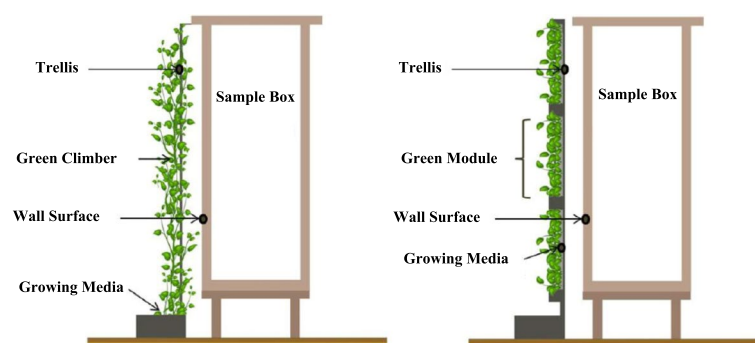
The main concept of the green façade (left) and living wall (right) [8]. The green façade where plants are directly on the wall with roots in the ground or upon a net fastened to the wall with roots in the earth. The living wall where plants; their roots are on-wall-mounted units or upon a net fixed to the wall, and the roots do not extend into the ground
